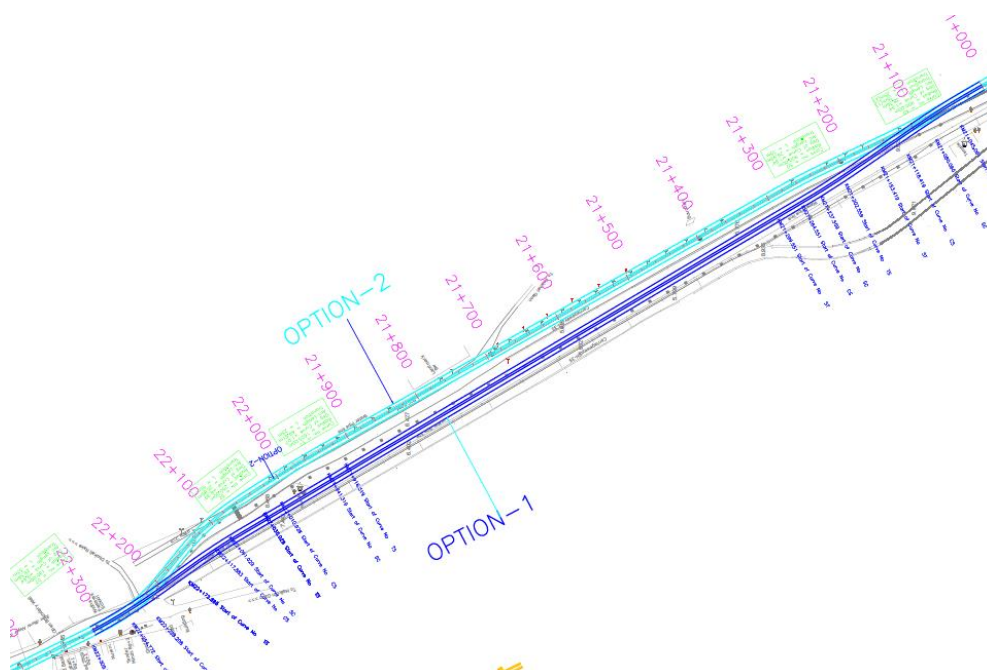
Section of Alignment showing proposed bridge over Vasai: Section of Alignment showing Option-1 and Option-2 between Kasheli Bridge (Ch 21+000) to Dhokali Naka (Ch. 22+200)
